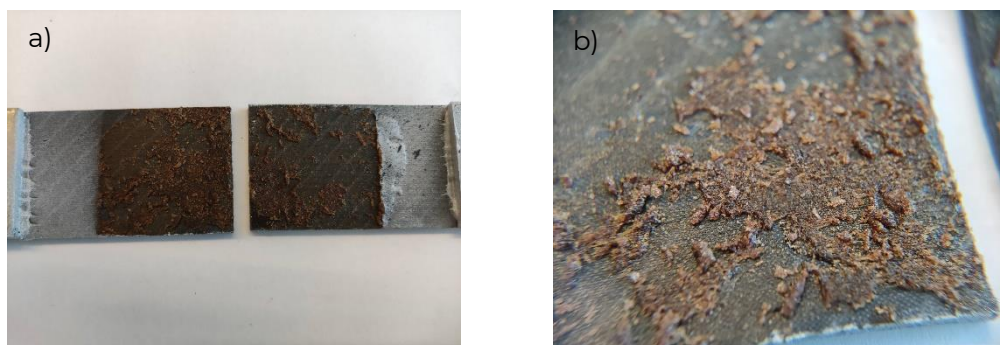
Specimens' failure surfaces: a) Exterior; b) Interior
